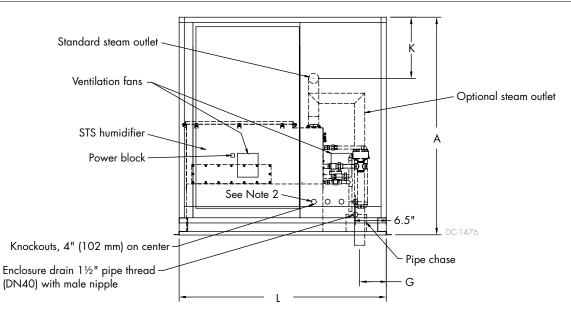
OUTDOOR ENCLOSURE WITH STANDARD OR OPTIONAL STEAM OUTLET, ELEVATION VIEW
